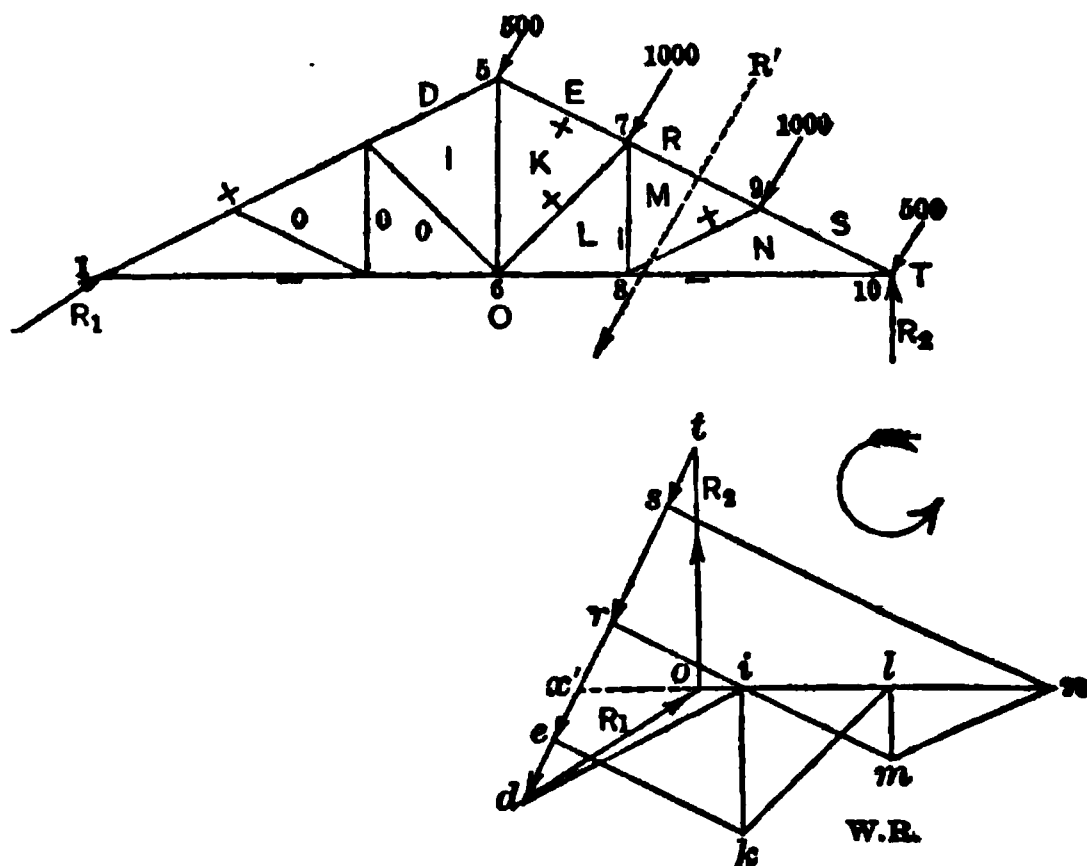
Triangular Truss. Truss-diagram and Stress-diagram, Wind Right
